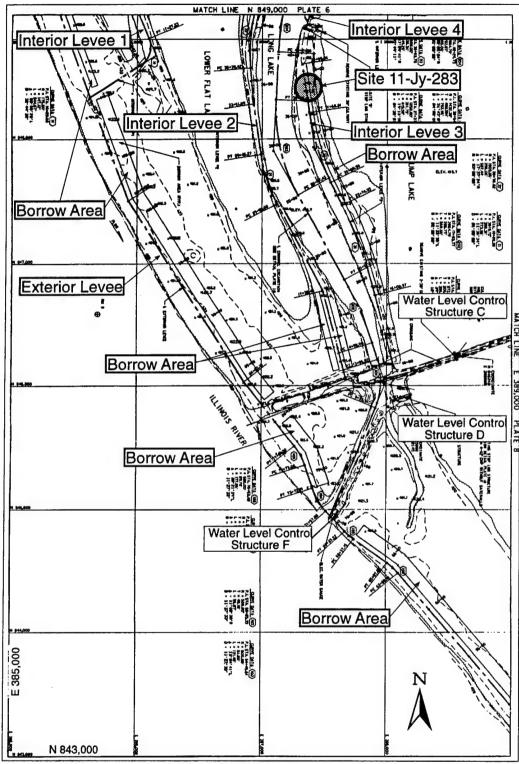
Stump Lake Complex HREP/EMP Project Area Plan, N843,000-N849,000.
